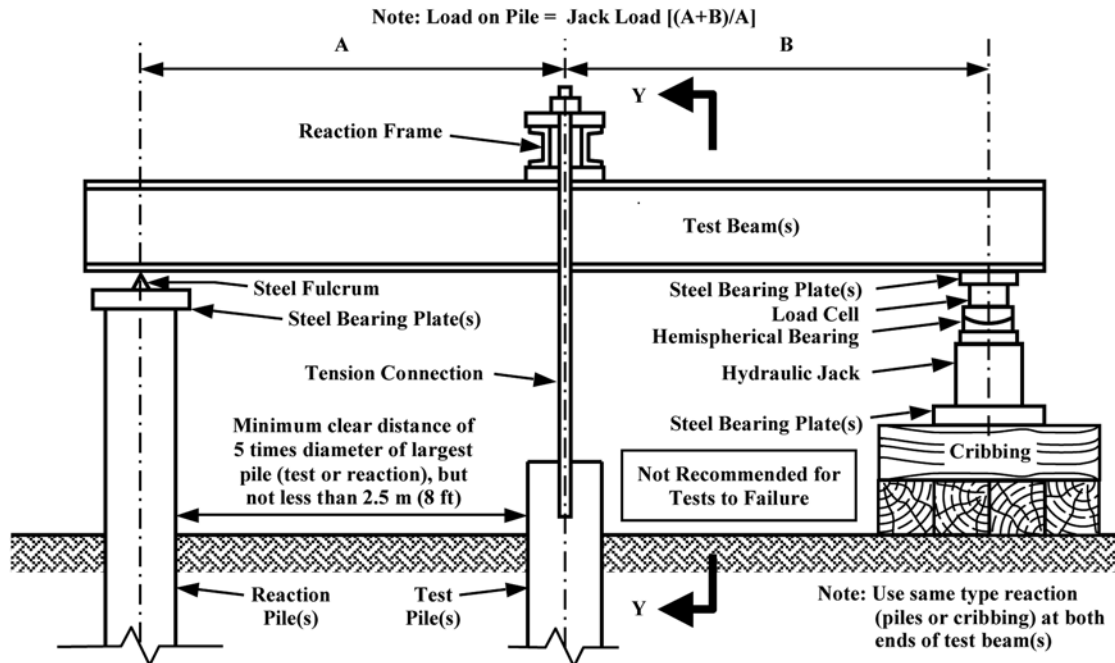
Typical Setup for Tensile Load Test Using Hydraulic Jack(s) Acting Upward on One End of Test Beam(s)
